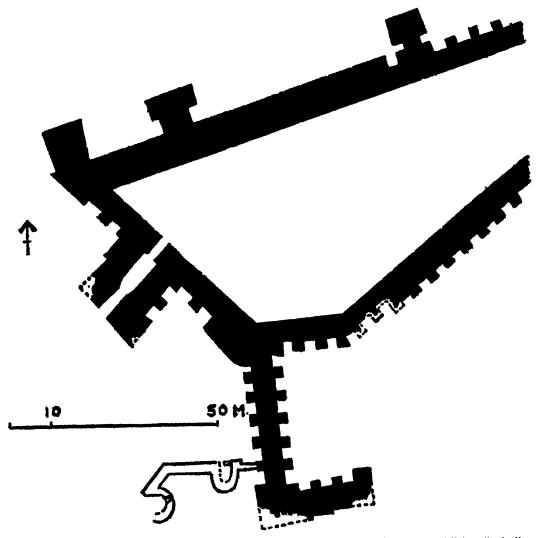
Uronarti Fort. Plan of wall and spur at south end (in filled outline) and addition (in hollow outline). After Kush 8, plan 1.
